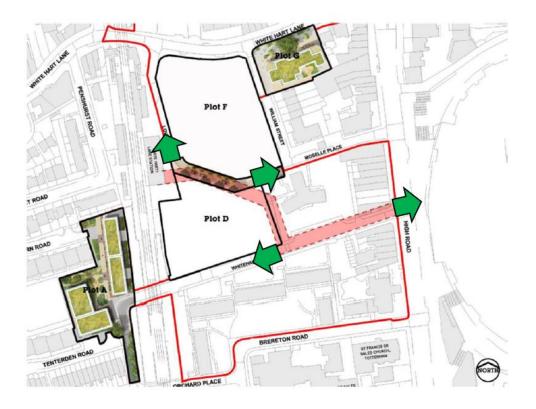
HRW Masterplan Construction Phasing – Indicative Hoarding Plan (2025 – 28)
